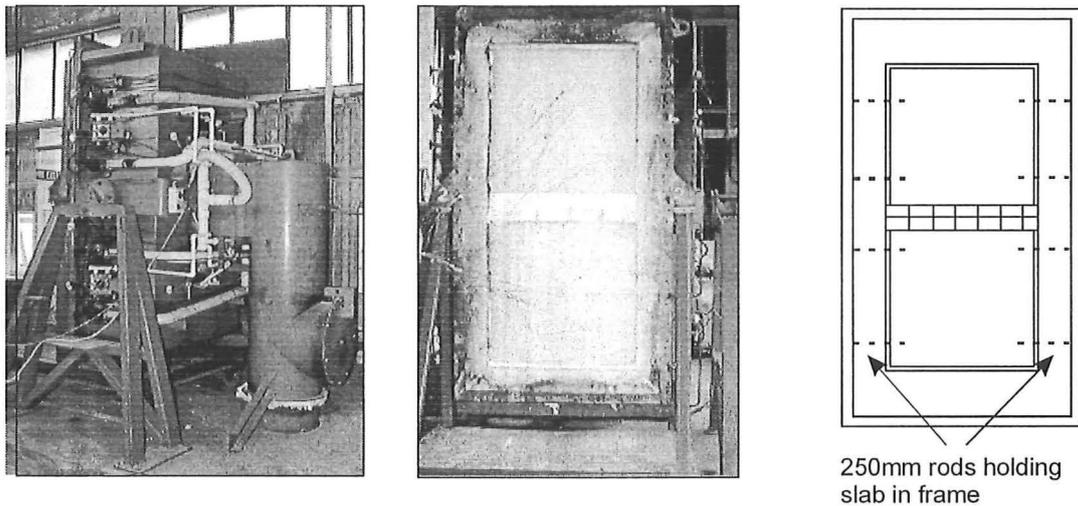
Pilot furnace at BRANZ (Wellington), and specimen mounted in furnace frame.
